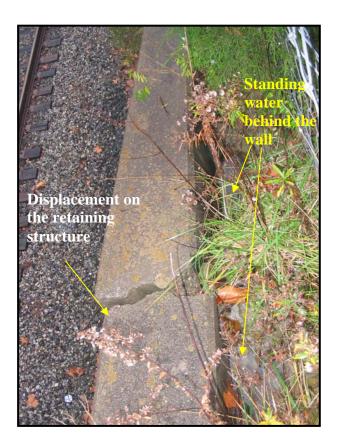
Displacement of retaining wall and standing water behind the wall
